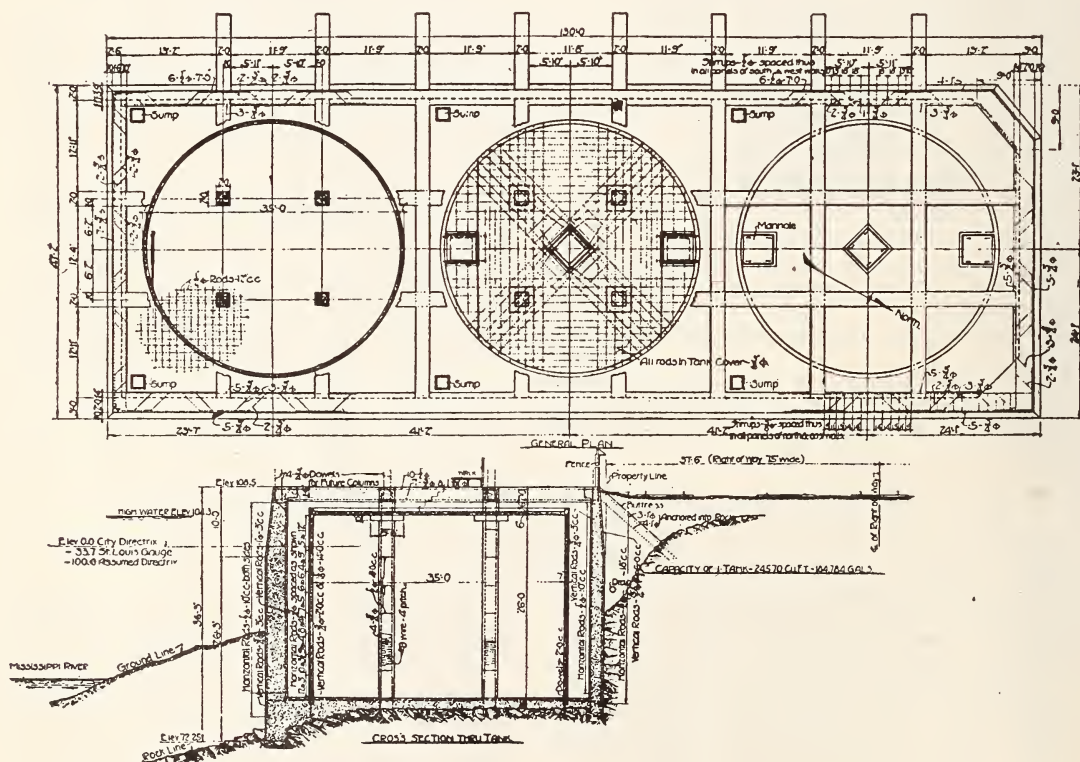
PLAN SHOWING GENERAL DESIGN, DIMENSIONS AND DETAILS
